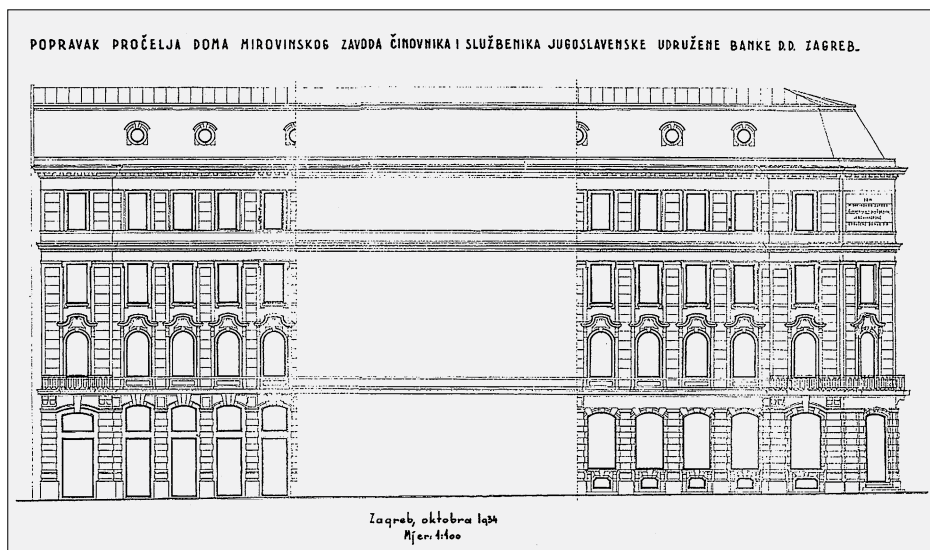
RENOVATION OF THE FAÇADE IN 1934
